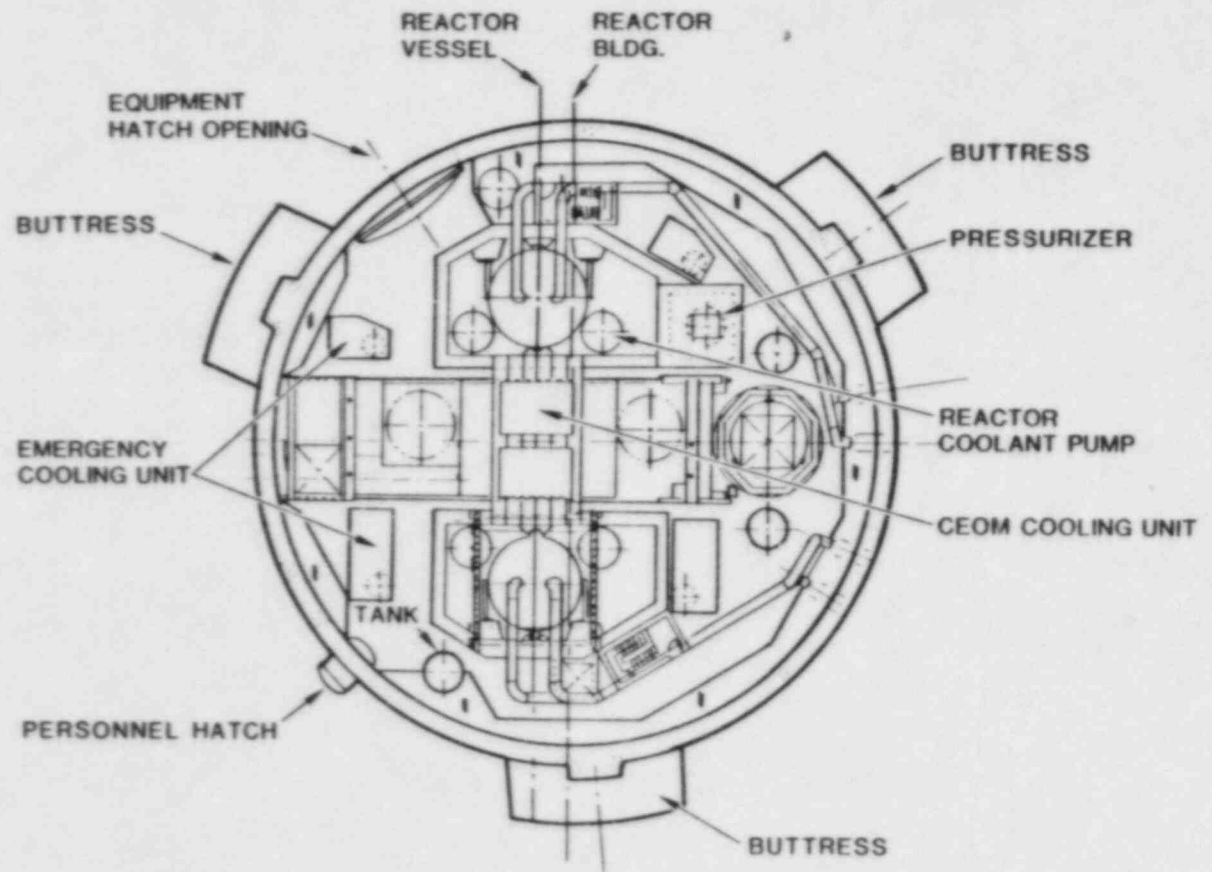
Arizona Nuclear Power Project Reactor Building Layout Plan at Operating Level, Elevation 140'-0"
